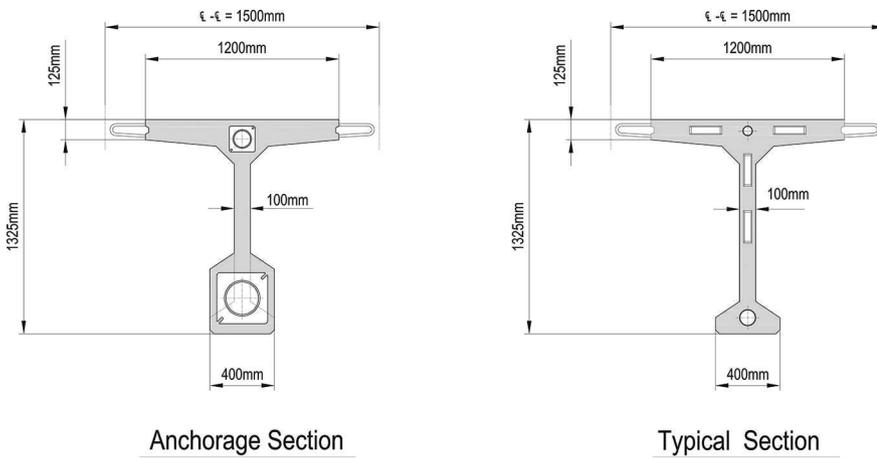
Decked bulb-tee section used in the Sungai Nerok Bridge. All Figures and Photos: DURA Technology. Note: 1 in. = 25.4 mm.
